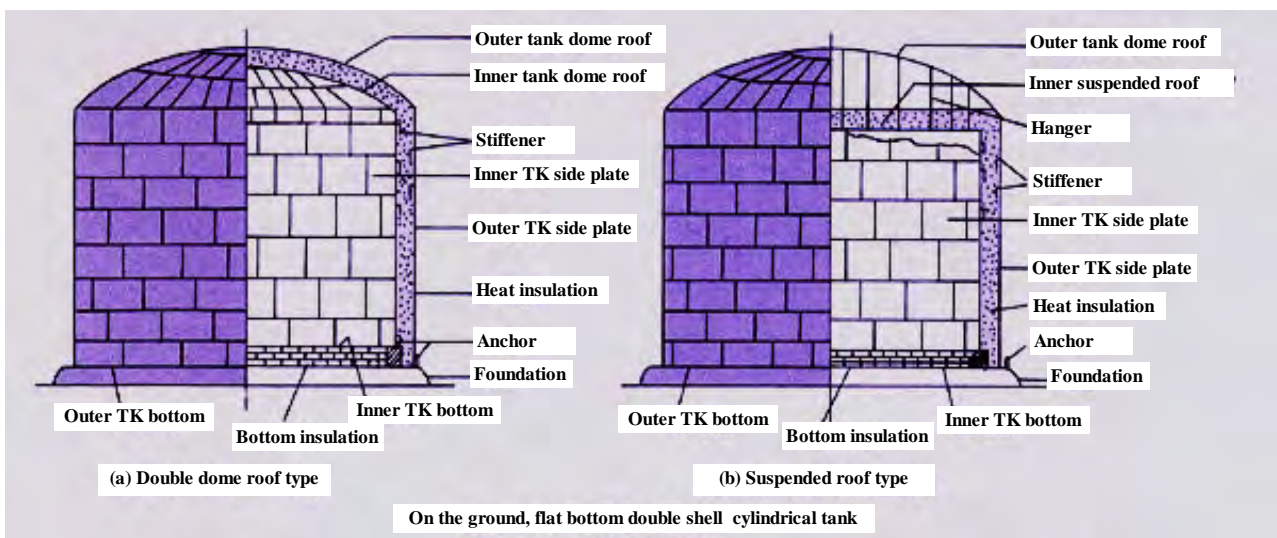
Typical construction of on the ground, flat bottom double shell cylindrical tank
